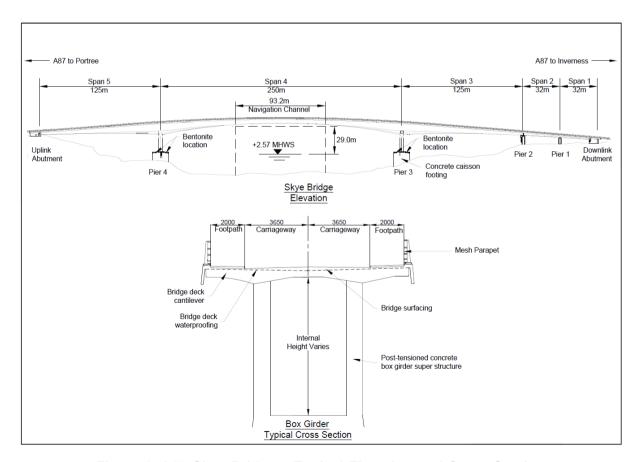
, A87 Skye Bridge - Typical Elevation and Cross Section
